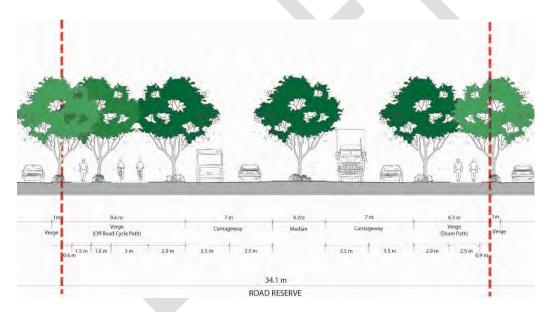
Sub-Arterial Road Cross Section (Off-Road Cycle Lane)
